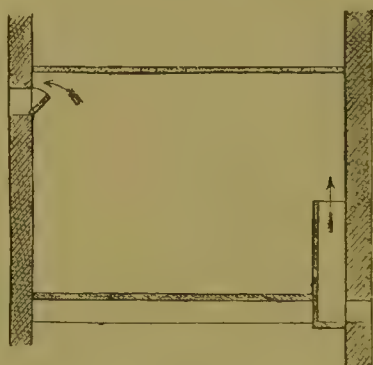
Tobin Tube and Sheringham Valve in position.
